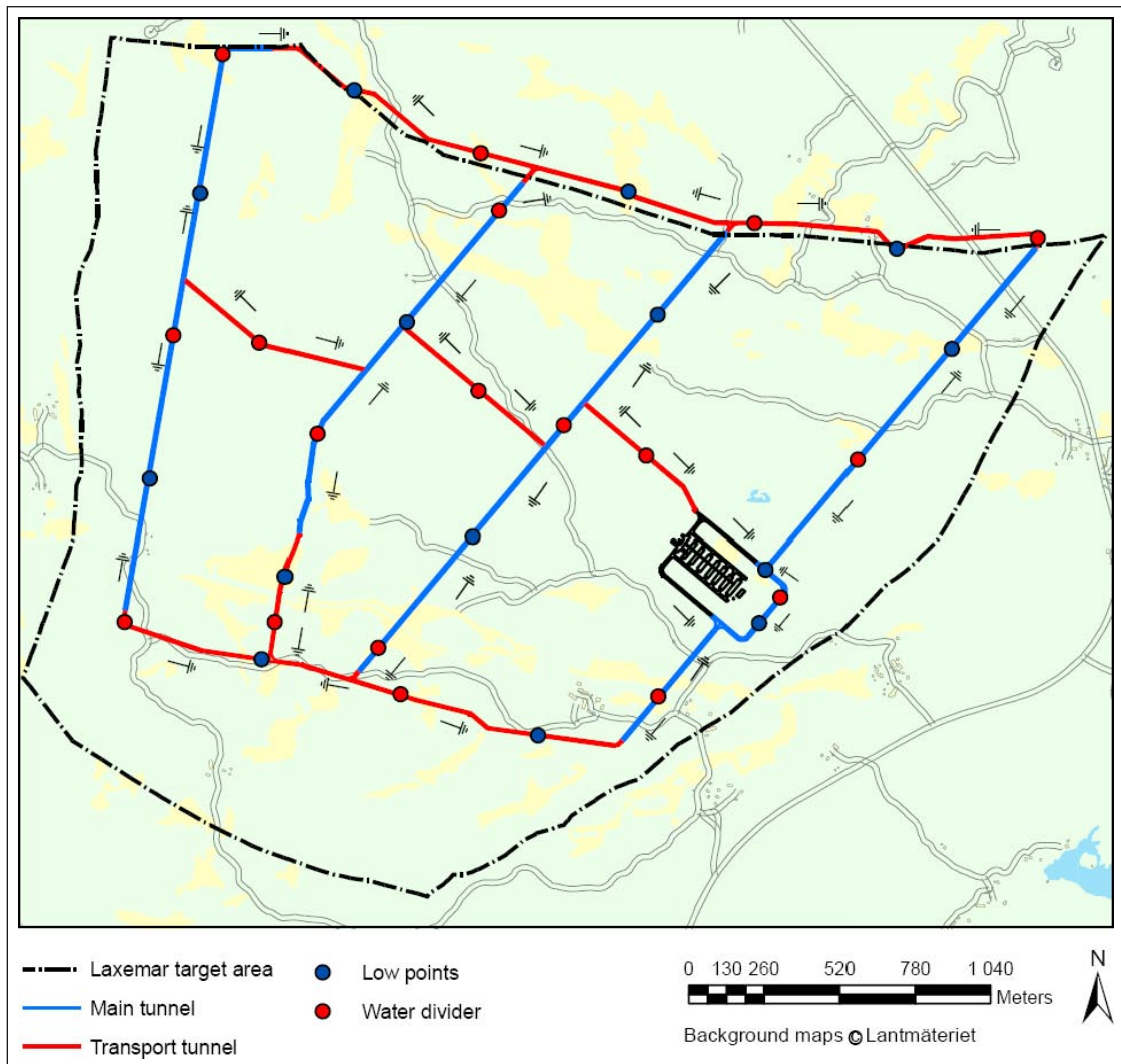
Figure shows the drainage system plan for the deposition area. The water will run from higher points (water divider) to the lower point where it will be pumped away.
